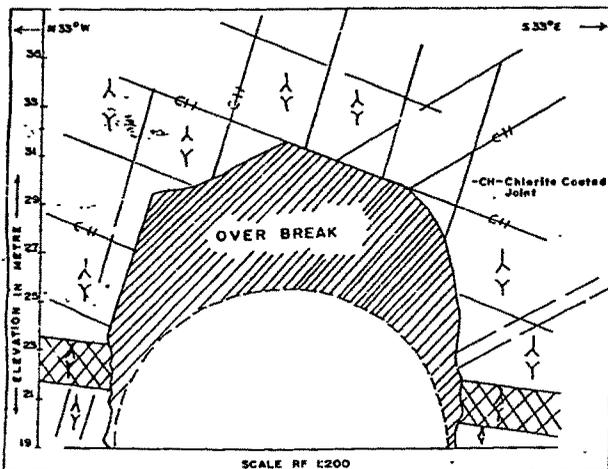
GEOLOGICAL CROSS SECTION OF EXIT TUNNEL- I. RD.79 m. (FOR INDEX REFER FIG 3)
